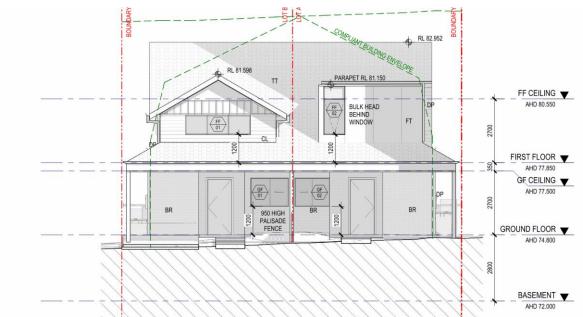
Proposed front (North) Elevation - 34 Frenchmans Road
